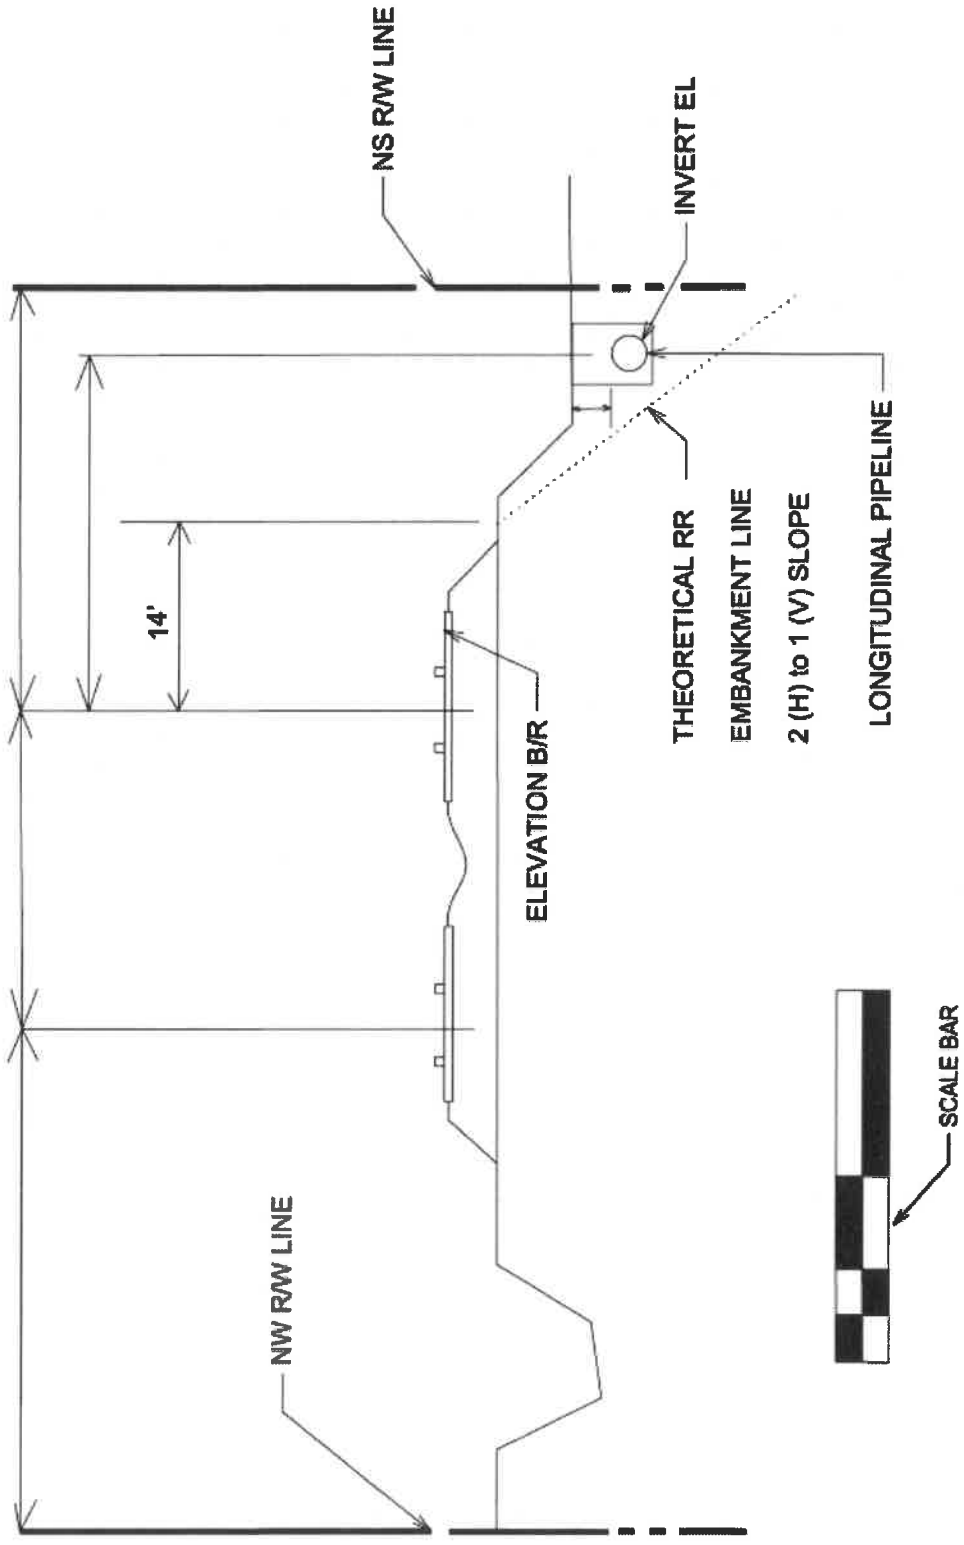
### Plate IV - Sample Pipe Parallel Plan and Profile Views
